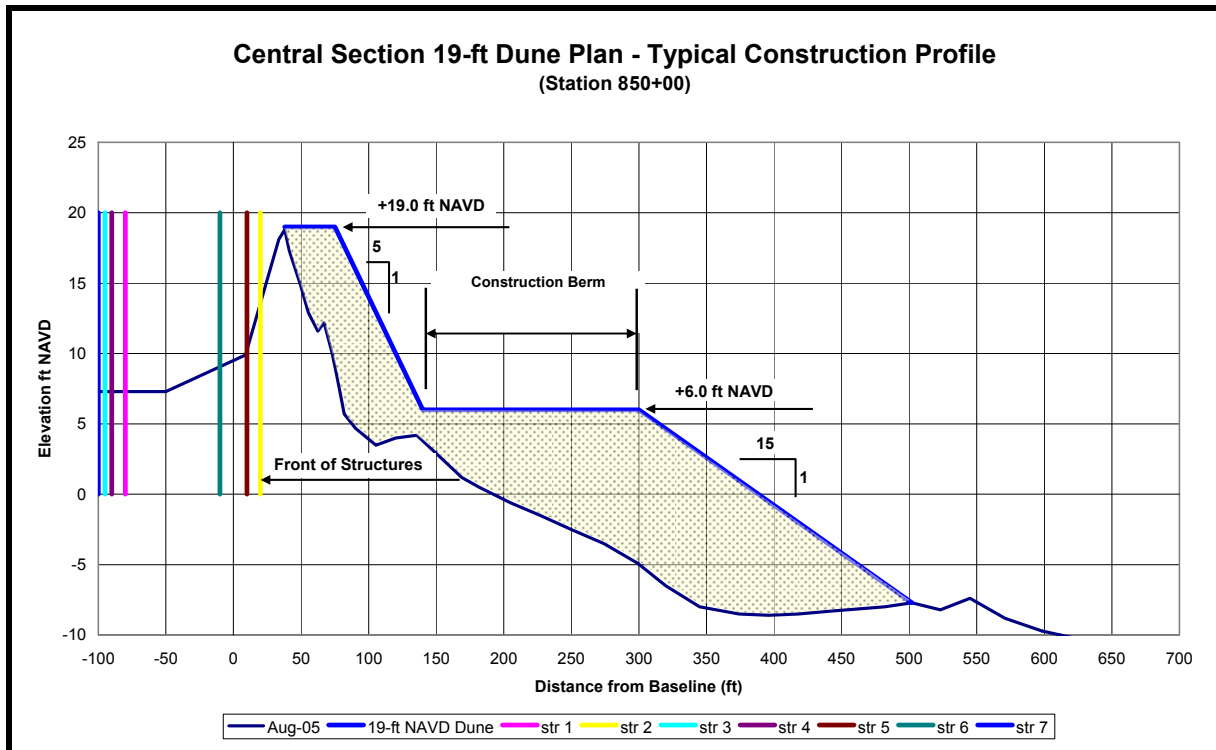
Typical construction profile, Central Section 19-foot Dune Plan (Station 850+00).
